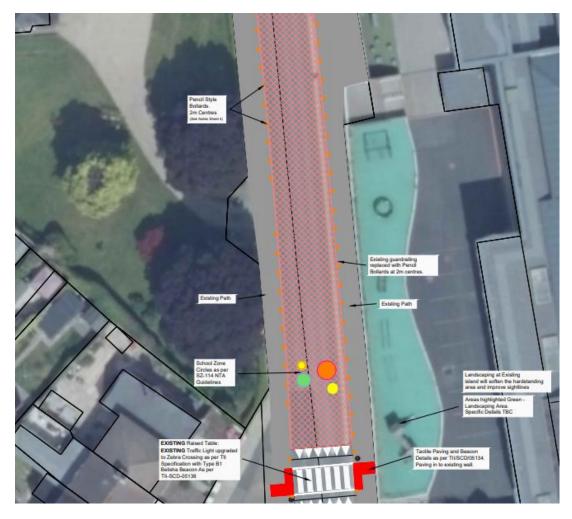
Example of design drawing for St Aidan's Parish School Safe Routes To School Scheme. Examples of bollards, road marking, tactile paving, and raised crossings are shown.
